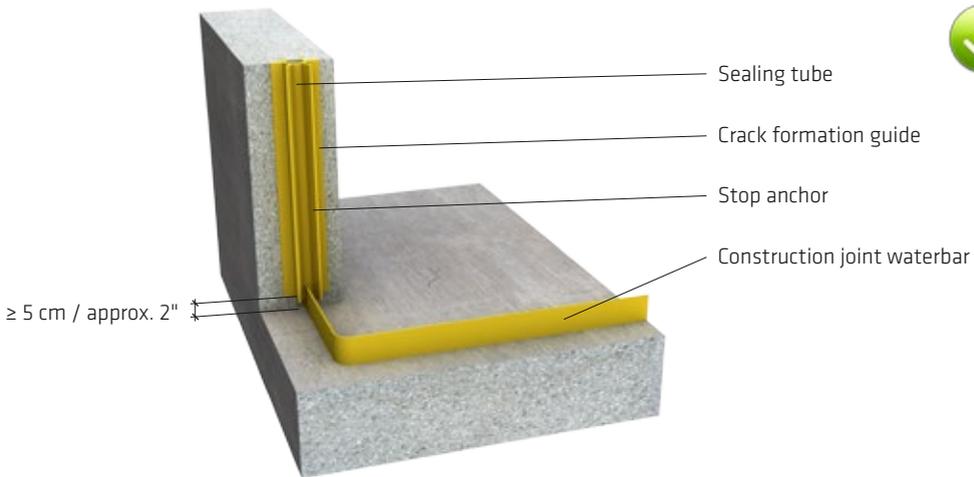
Design of the base of the wall for installation of crack inducing sealing tubes
